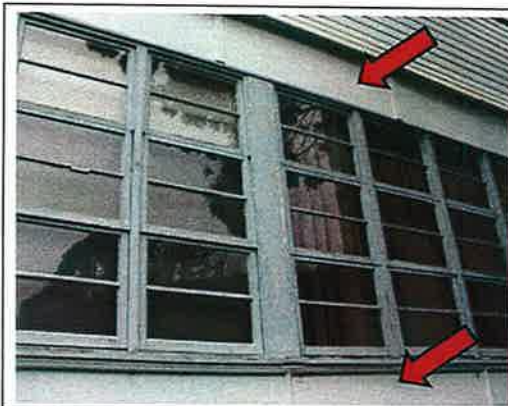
Exterior, Surrounding Building, Eaves – Suspected asbestos containing fibre cement sheeting
